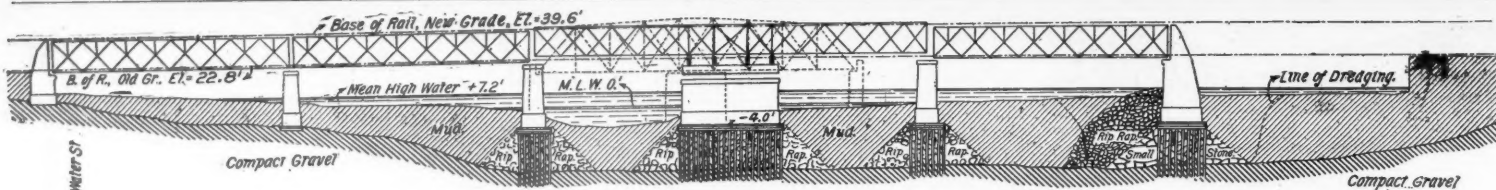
Four-Track Bridge, with 200-Ft. Drawspan, at South Norwalk, Conn.—New York, New Haven & Hartford Railroad.
